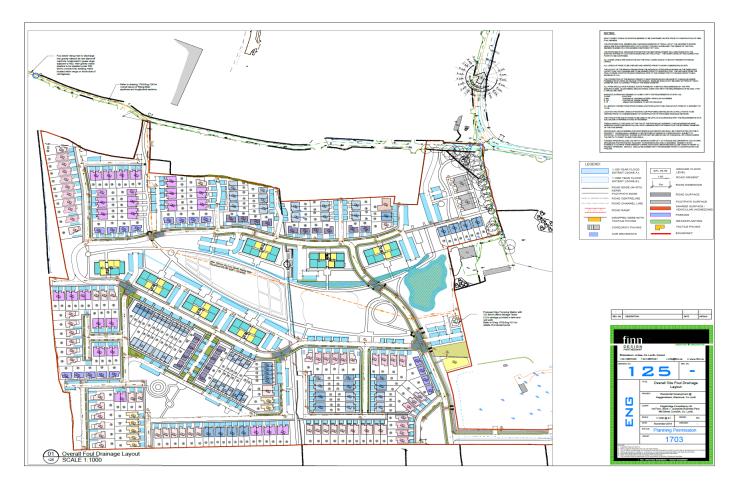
B – Finn Design Partnership Overall Site Foul Drainage Layout
